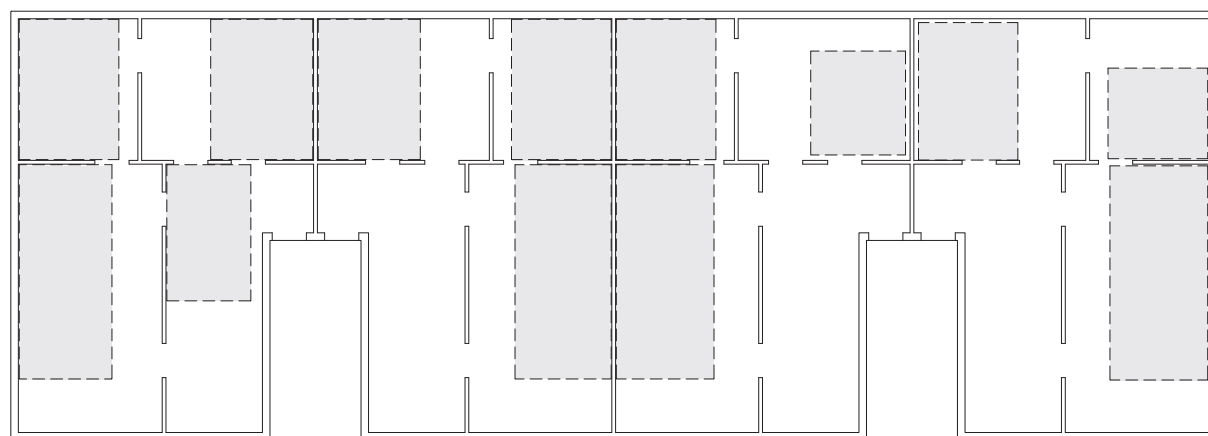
, Example of sawn out slab elements from Finspång, 1:200
